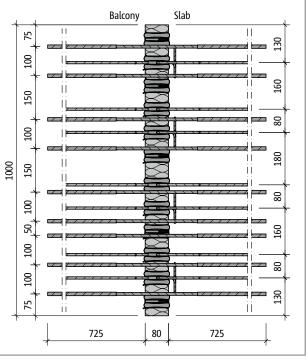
Schöck Isokorb® T type K-M7 to M11: Product section
